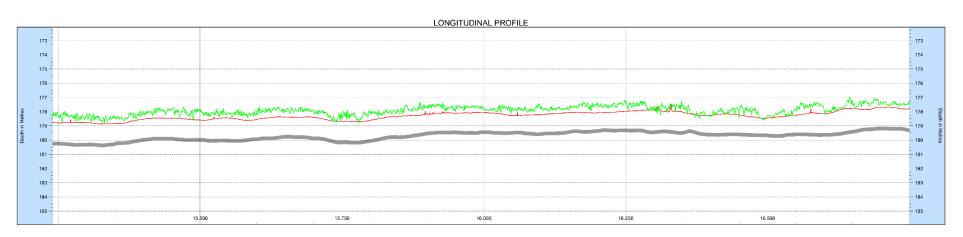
PL4556 As-built alignment sheet KP15.240 to KP16.750
